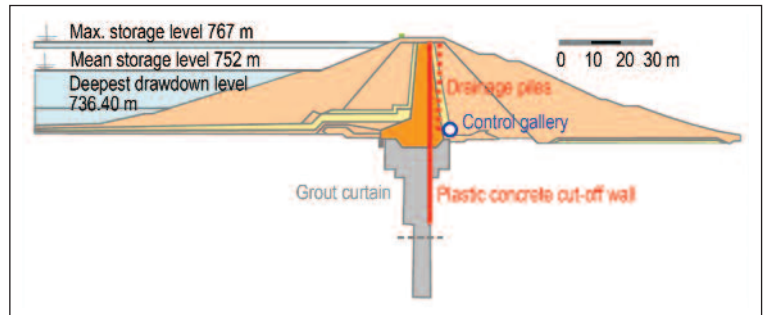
Dam cross section, showing the additional cut-off wall and seepage water measurement system.
